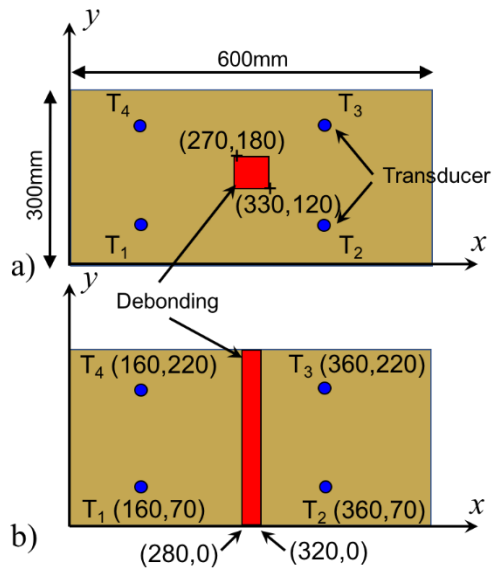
Schematic diagram of the CFRP-retrofitted concrete block and the layout of the surface-mounted transducer array (top view) a. concrete specimen 3 with 60mm×60mm debonding; and b. concrete specimen 4 with 40mm×300mm debonding
